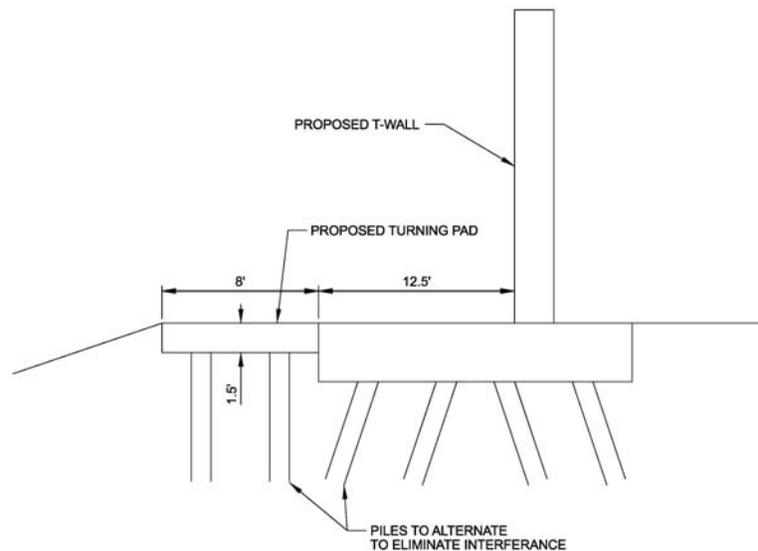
Cross-section of base slab and turn-around pad of floodwall
